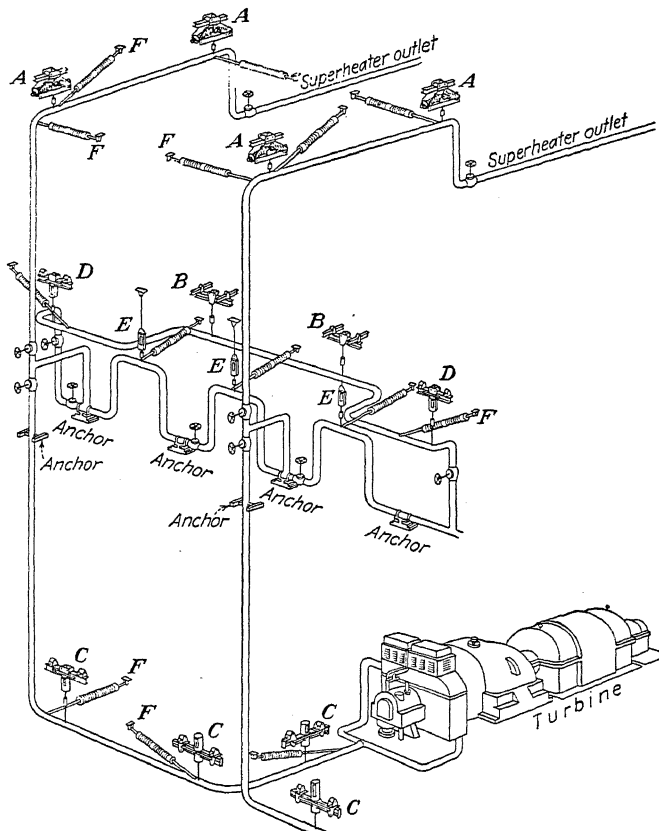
Typical application of hangers, anchors, and sway bracing for a main steam piping system.
